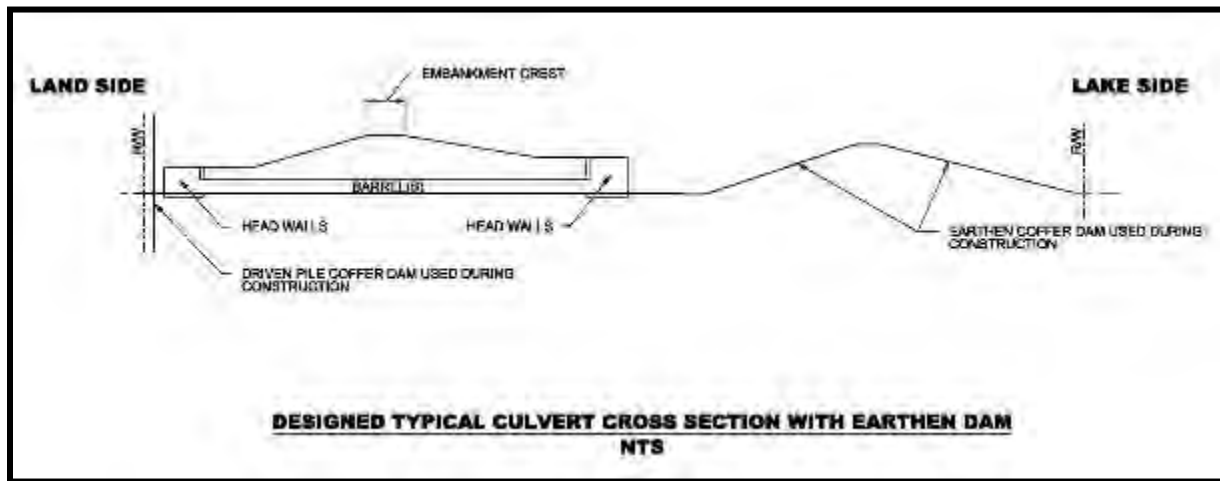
Typical Construction Footprint with Earthen Cofferdam
